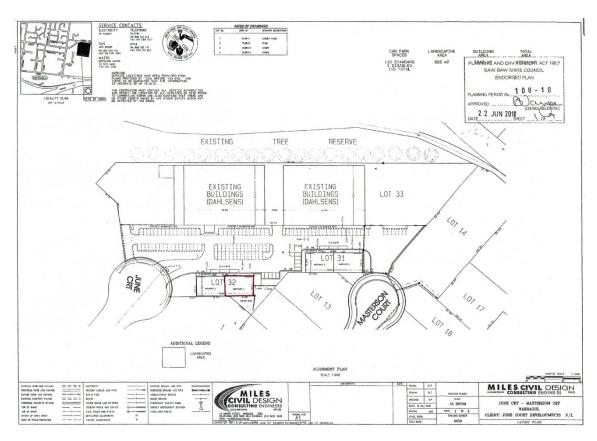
Endorsed Site Layout Plan for Planning Permit 108-10 for which the subject unit forms part.
